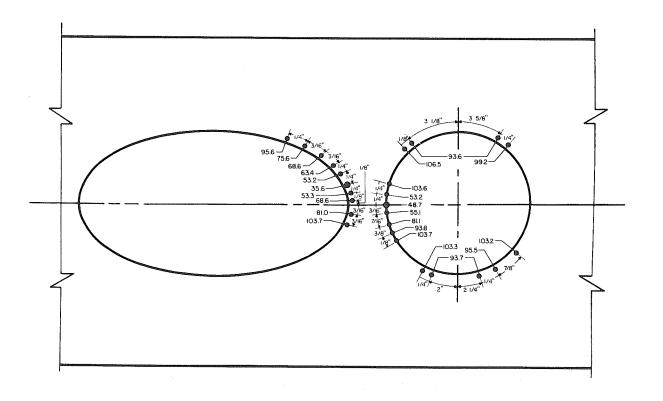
JOINT TYPE I - SPECIMEN No. 2, DETAILED CRACK PROPAGATION
